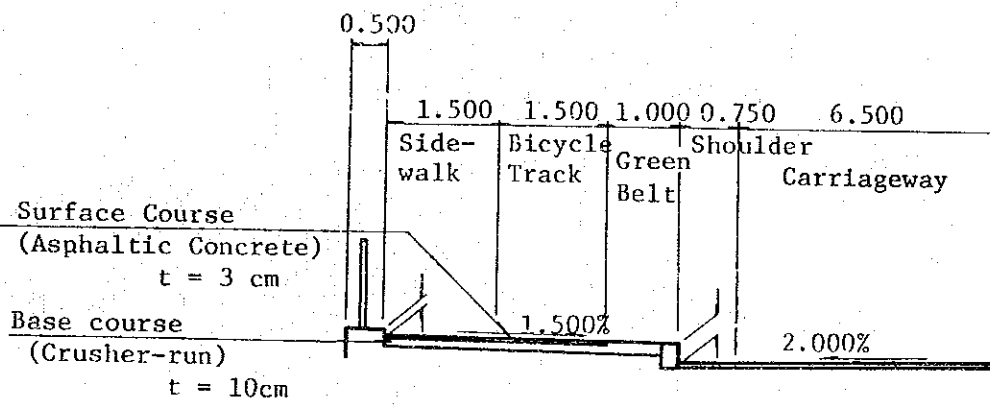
Pavement Structure for Sidewalk/Bicycle track in Bridge Section
